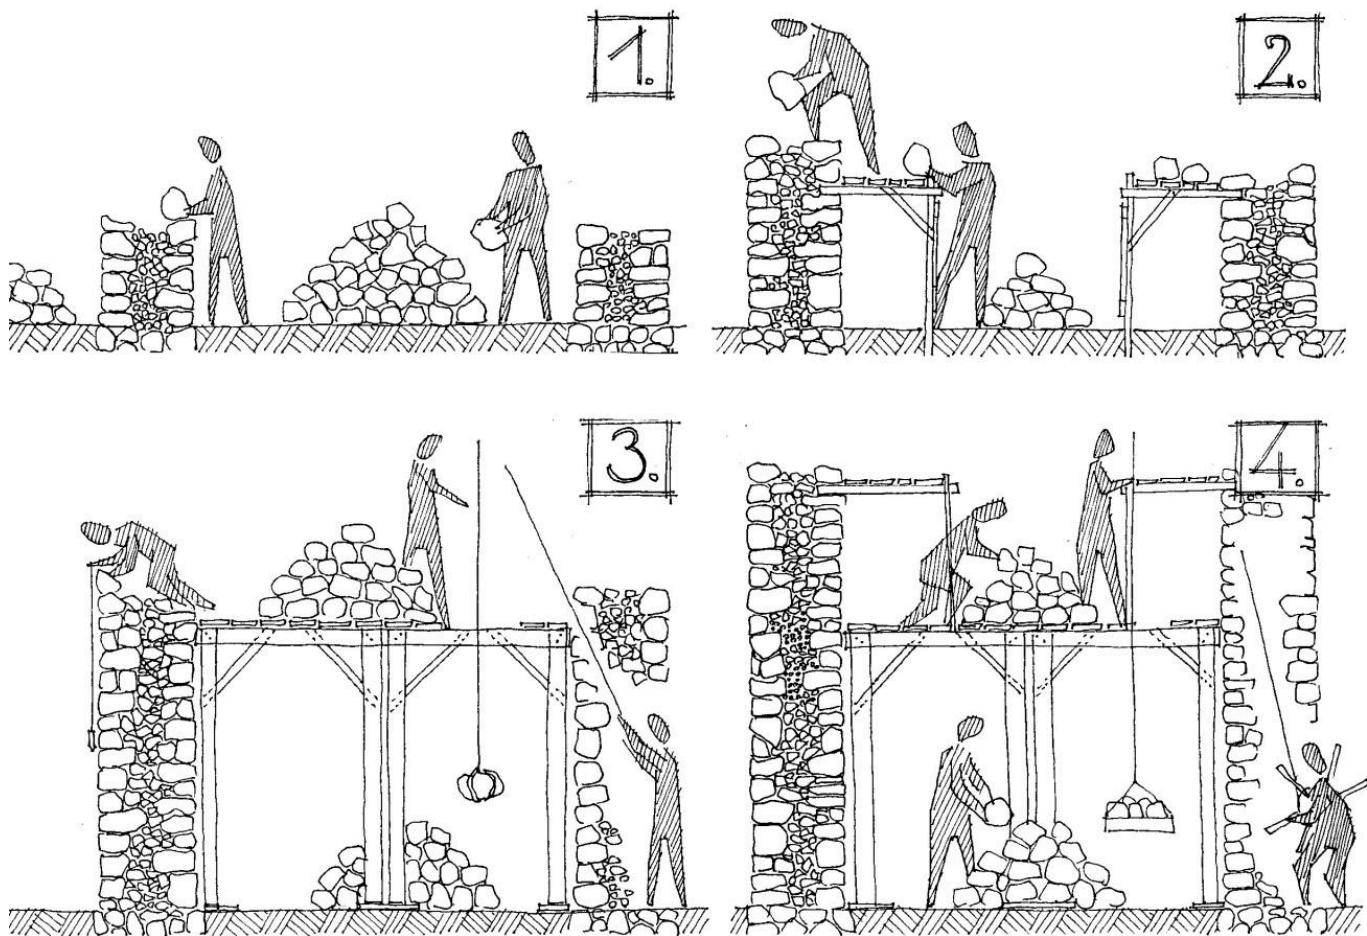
THE LARGE NUMBER OF STONES USED, REQUIRES STRONG AND STABLE SCAFFOLDING INSIDE THE BUILDING.
